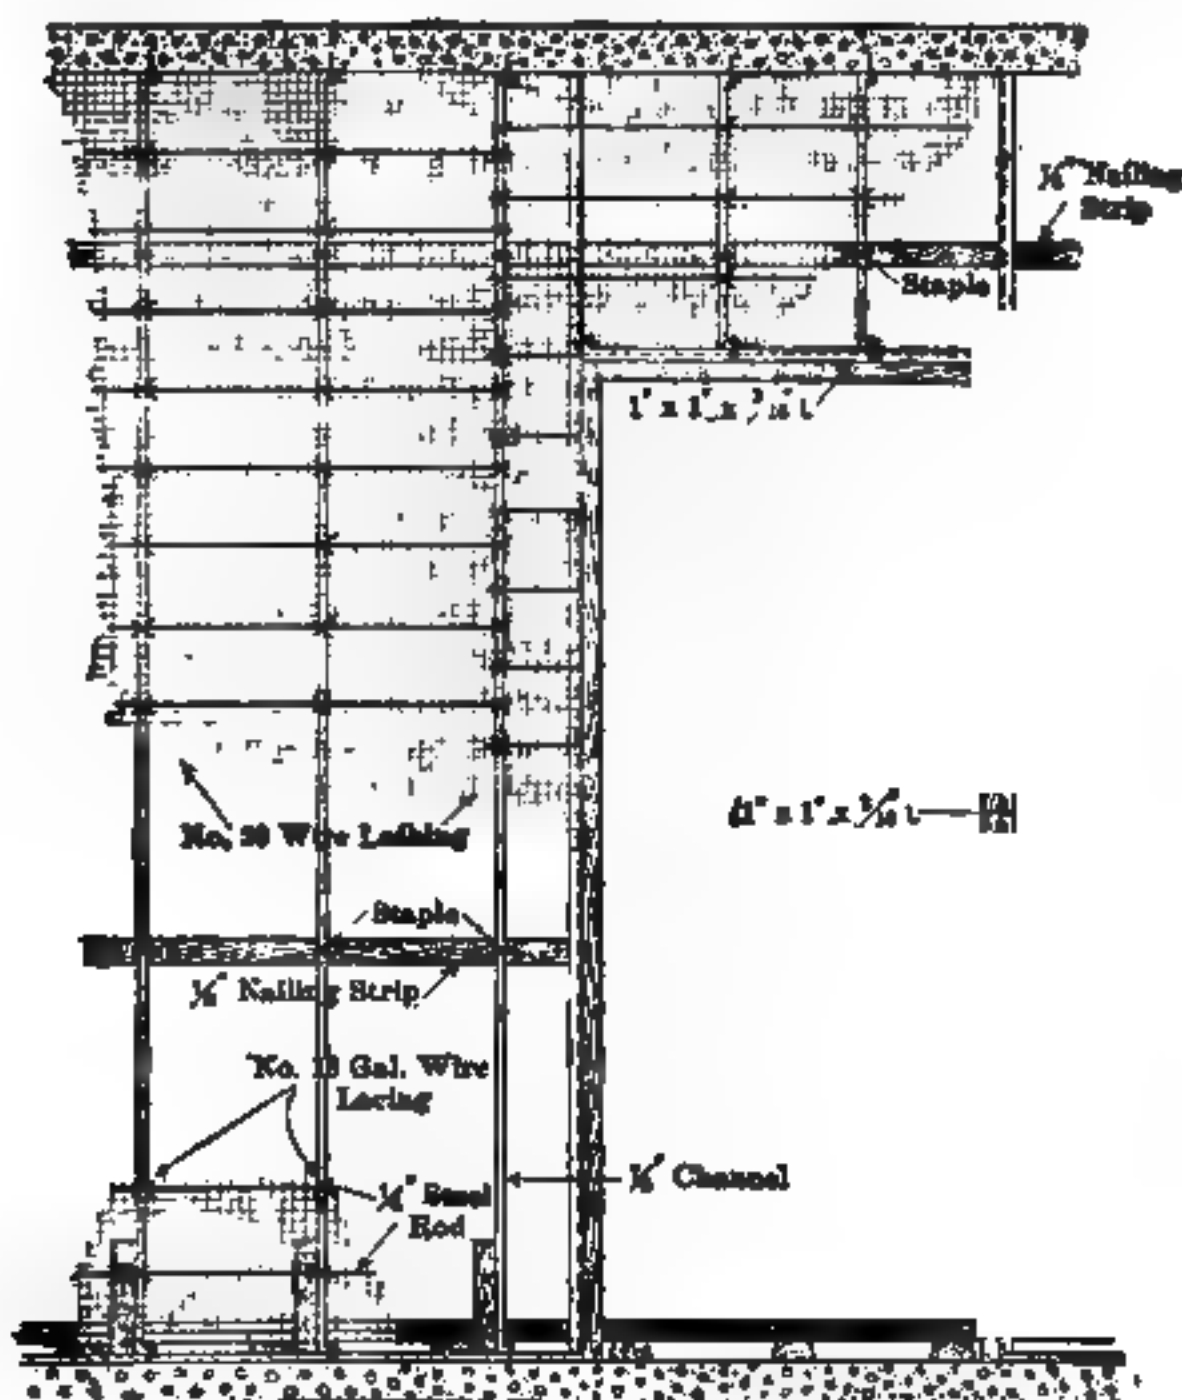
Two-inch Solid Plaster Partition. Elevation
